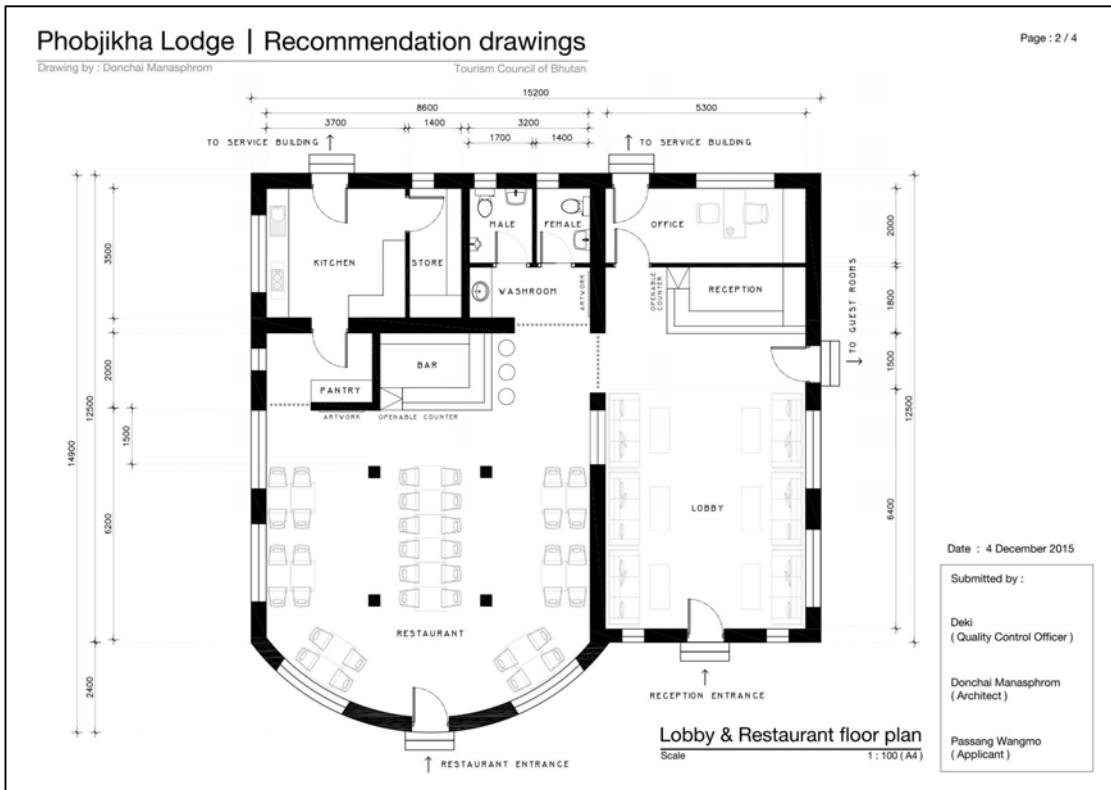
Phobjikha lodge recommendation drawings – Main building floor plans
